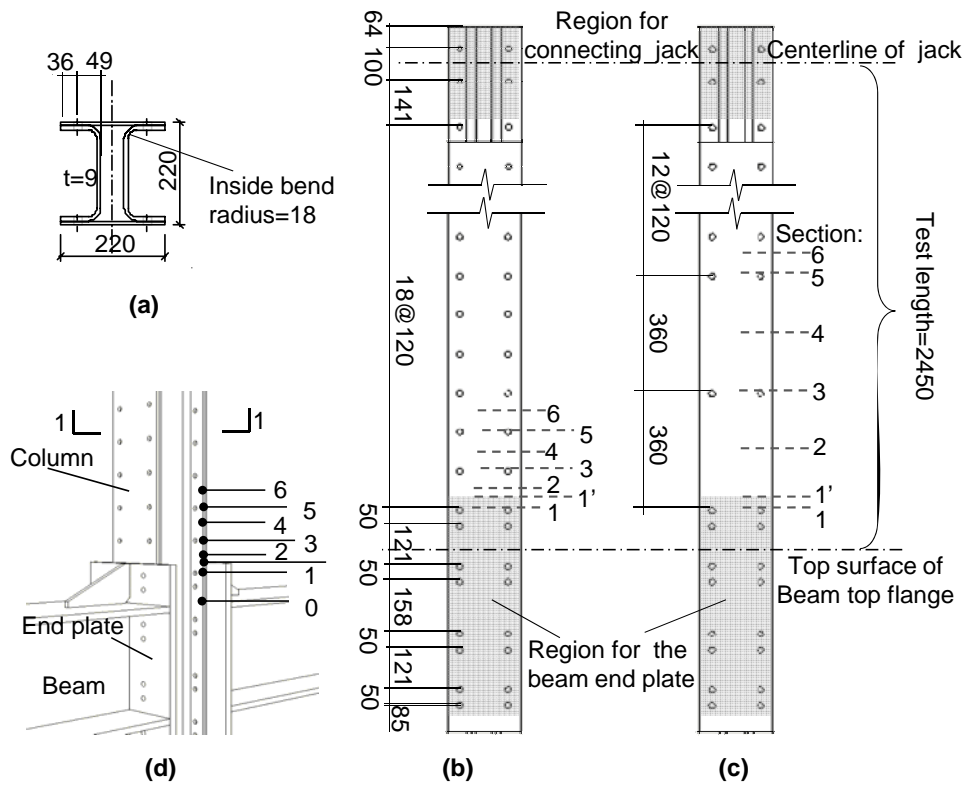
Details of specimens: (a) column sections; and (b) bolt-hole arrangement in Specimens S-120 and H-120; (c) bolt-hole arrangement in Specimen H-360; and (d) connection (unit: mm).
